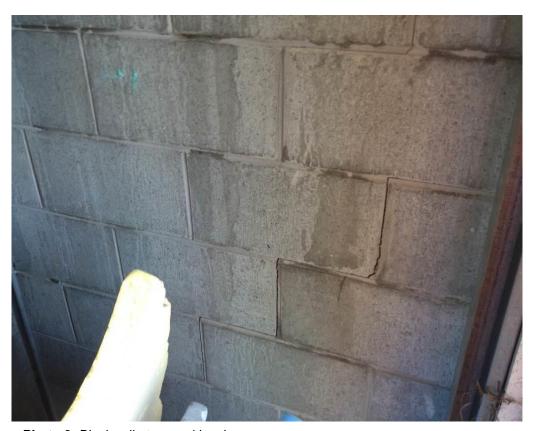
Blockwall at ground level.Damage Description: Stepped cracks in mortar bed joints.
